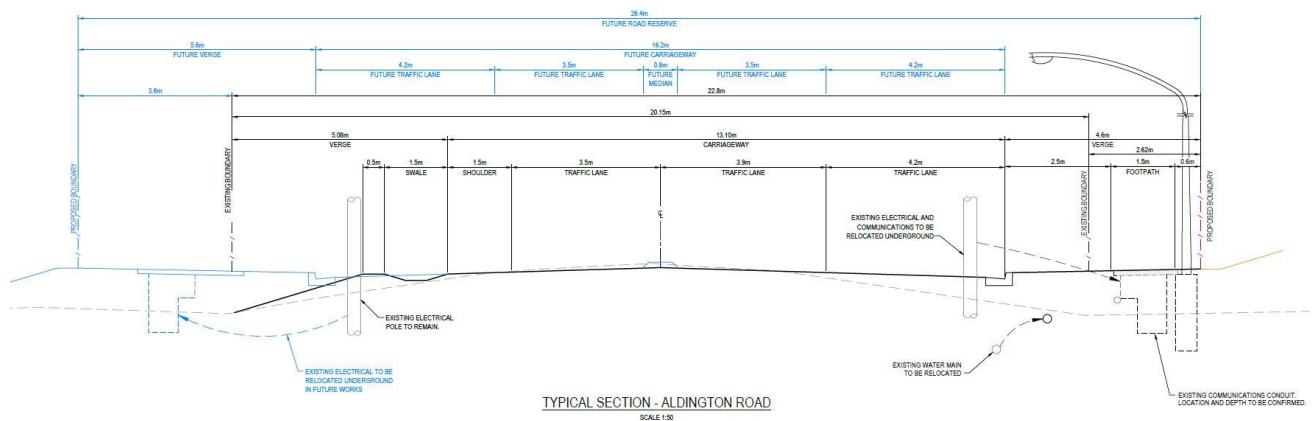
Typical Section of the proposed upgrade of Aldington Road
